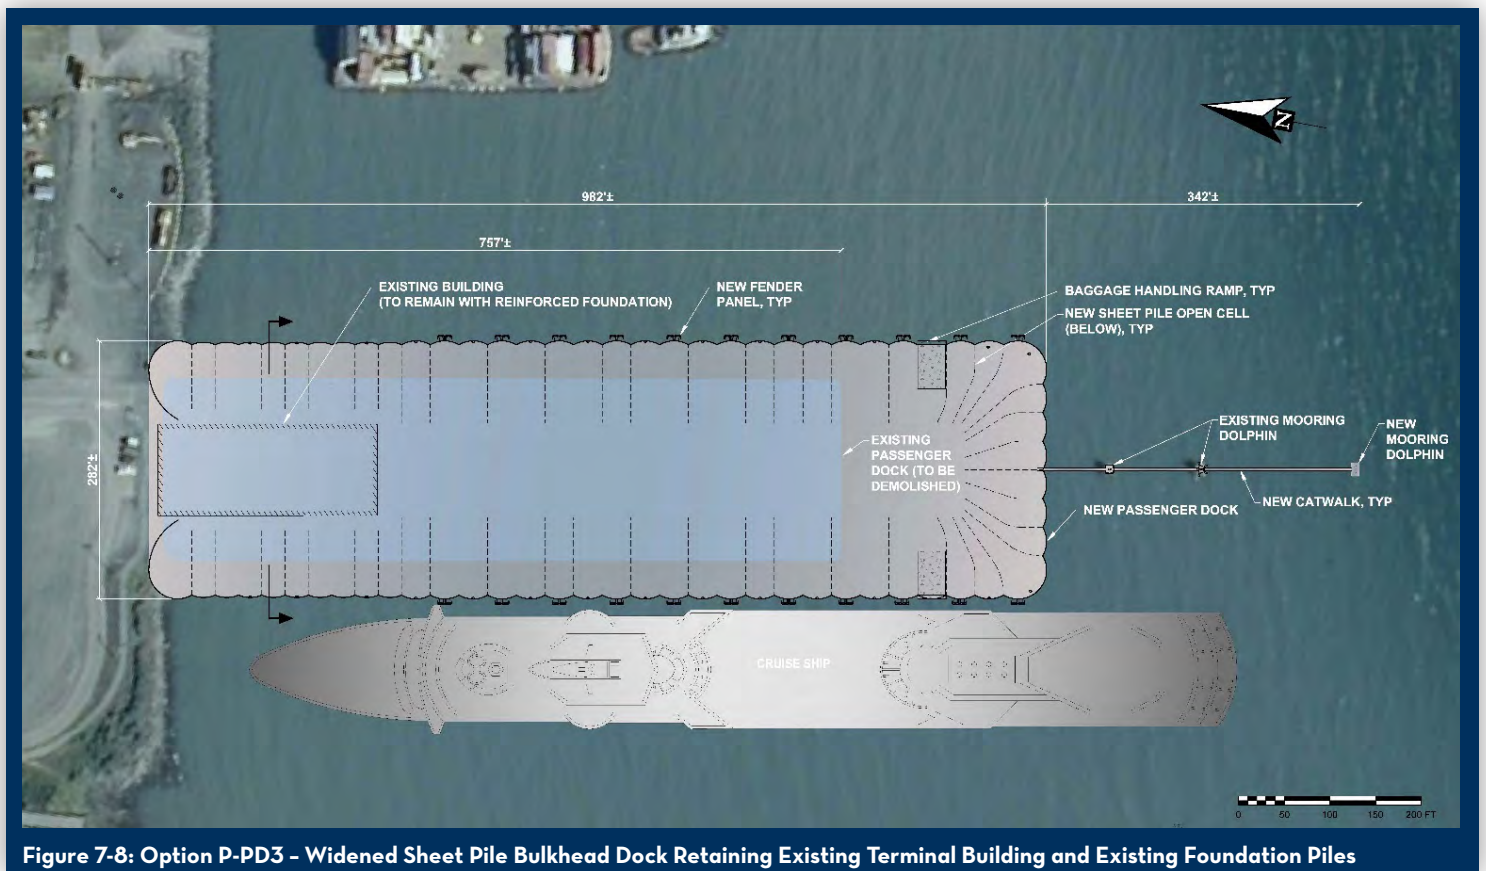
Option P-PD3 - Widened Sheet Pile Bulkhead Dock Retaining Existing Terminal Building and Existing Foundation Piles
